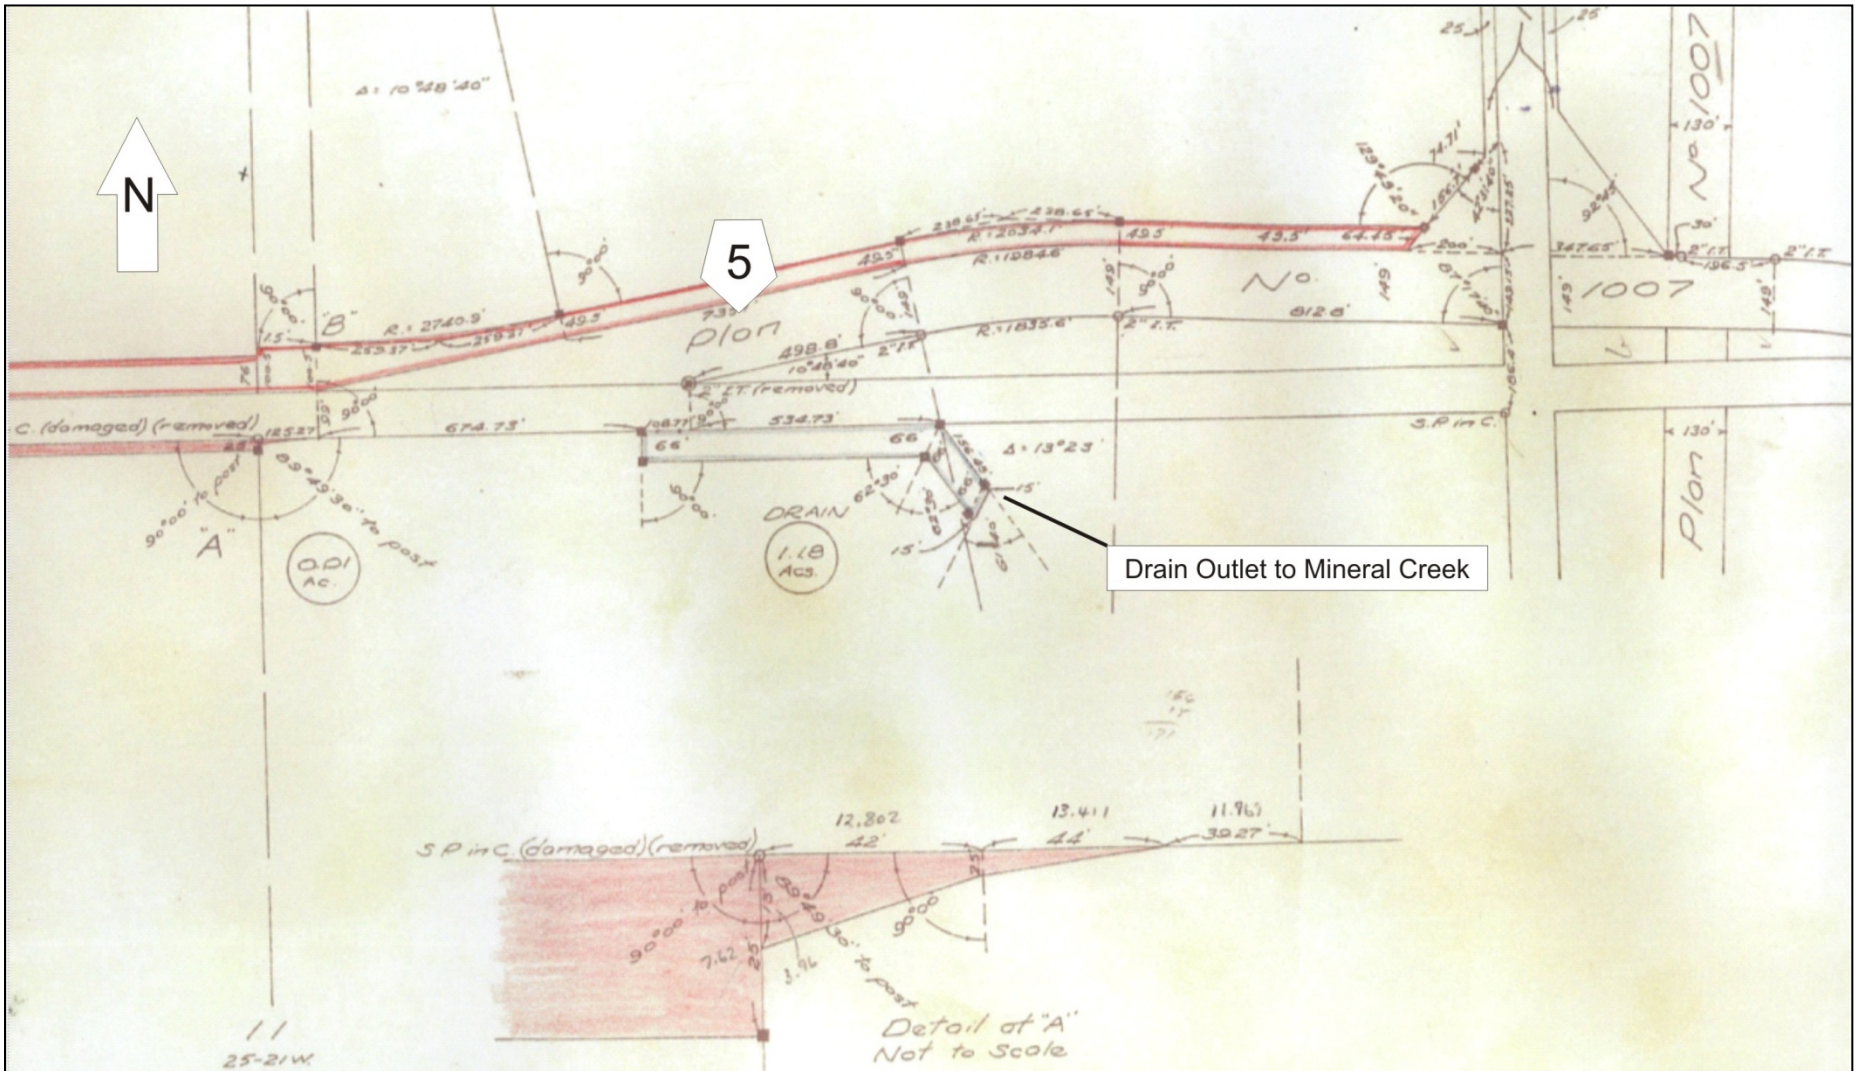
1965 Proposed Drainage Works West of Existing Failure (See Figure 1.2 for drain location)
